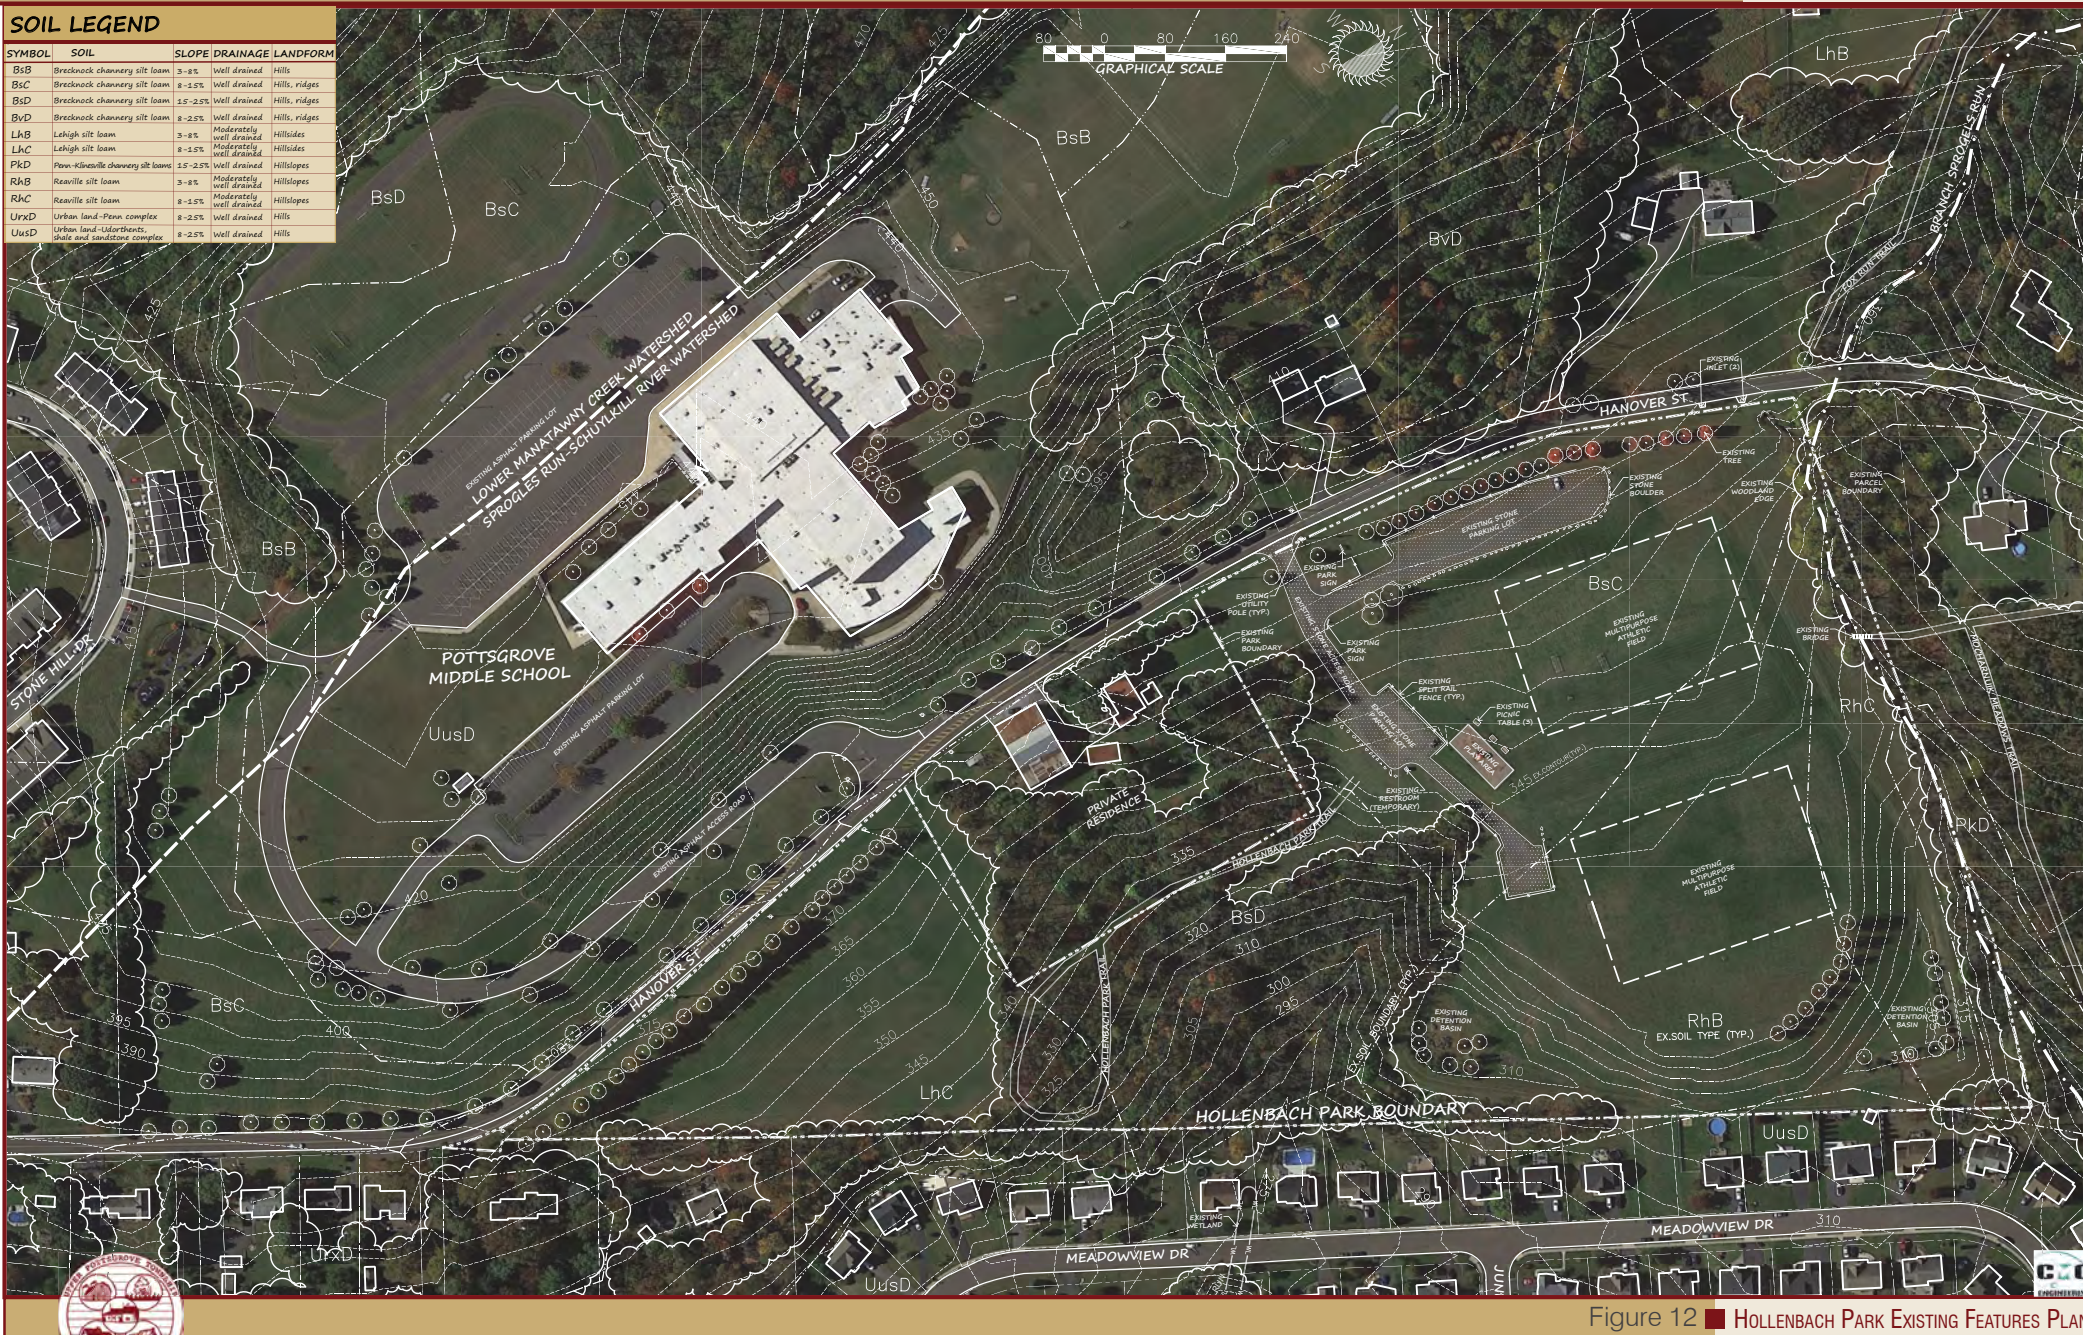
HOLLENBACH PARK EXISTING FEATURES PLAN
